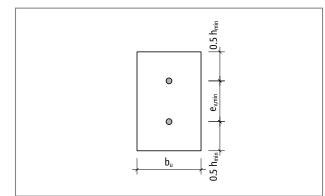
Schöck Dorn type LD: Minimum structural component dimesnions and dowel spacings on the front face of a beam or a wall
